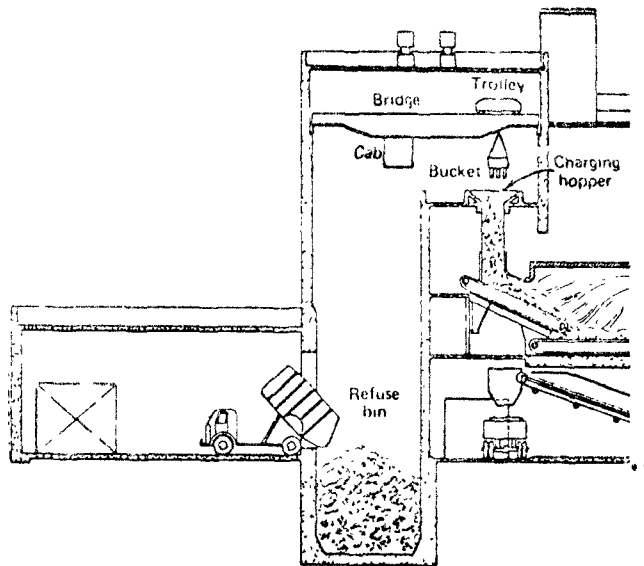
TYPICAL LAYOUT FOR SUBGRADE STORAGE PIT WITH OVERHEAD CRANE, CHARGING HOPPER AND CHUTE.³
